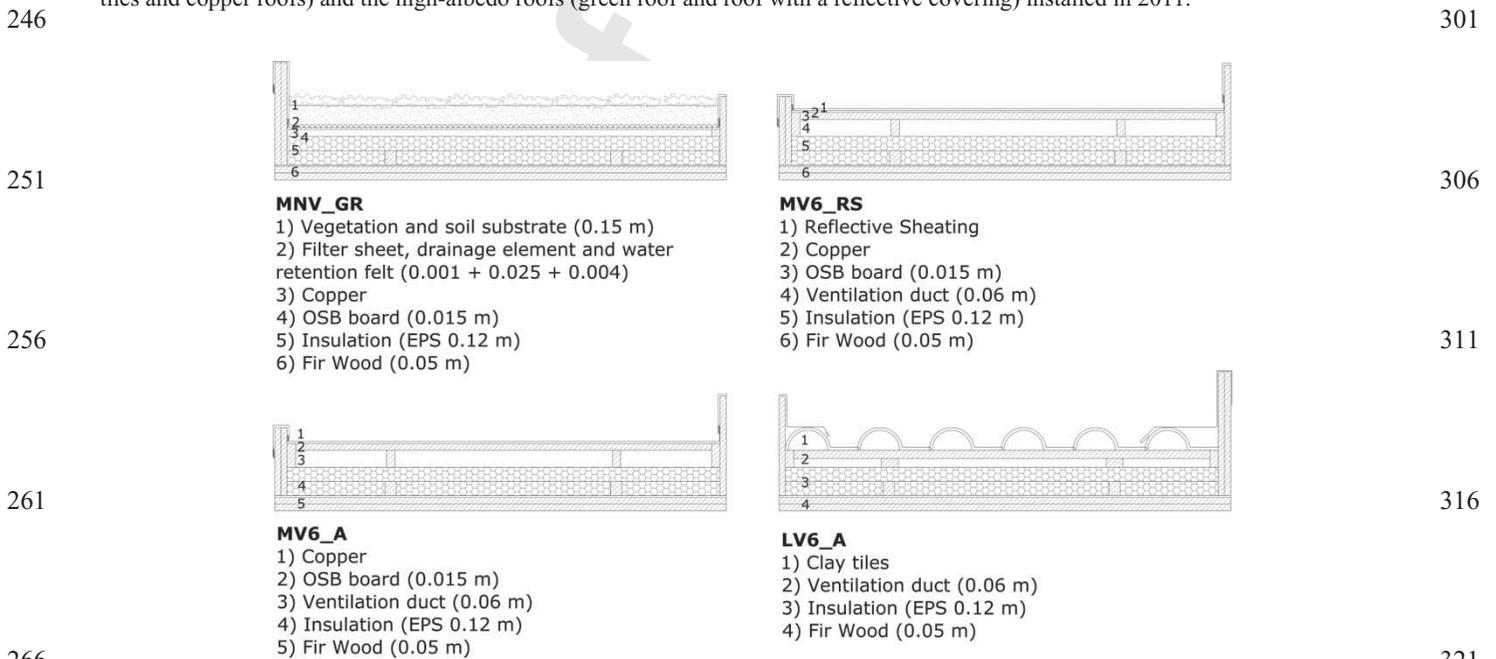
Stratigraphies of the four roofs installed in the experimental building: two ventilated clay tiles and copper roofs (LV6_A, MV6_A), a green roof (MNV_GR) and a roof with a reflective covering (MV6_RS).
